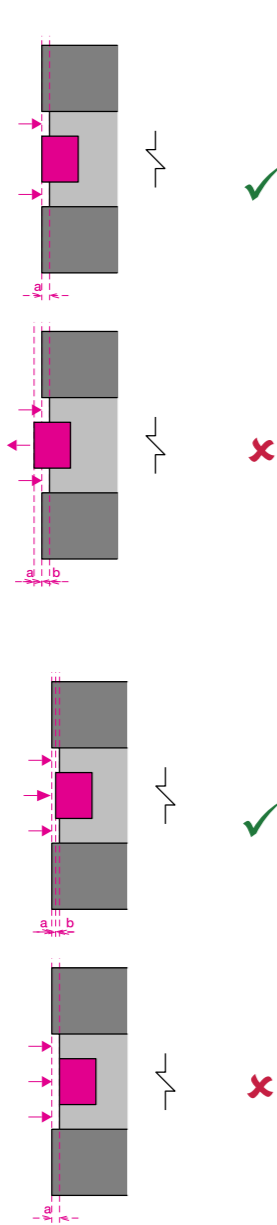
Plan diagrams: Massing expression of infill Townhouses.
